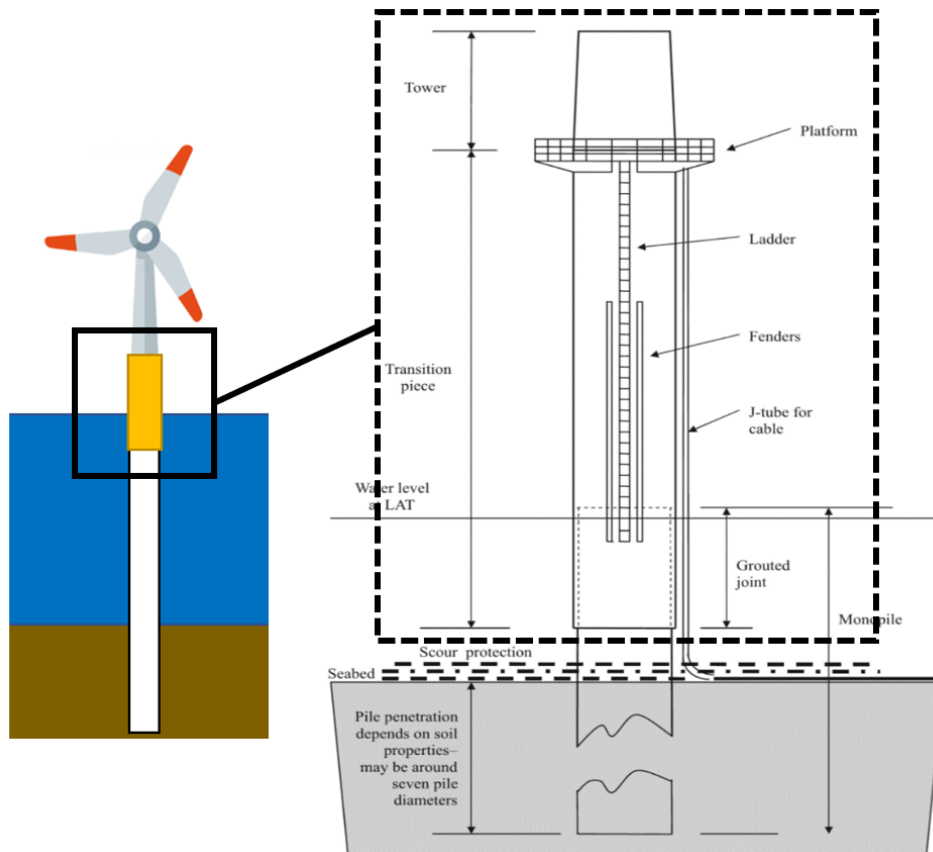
Typical arrangement of monopile and transition piece [10]
